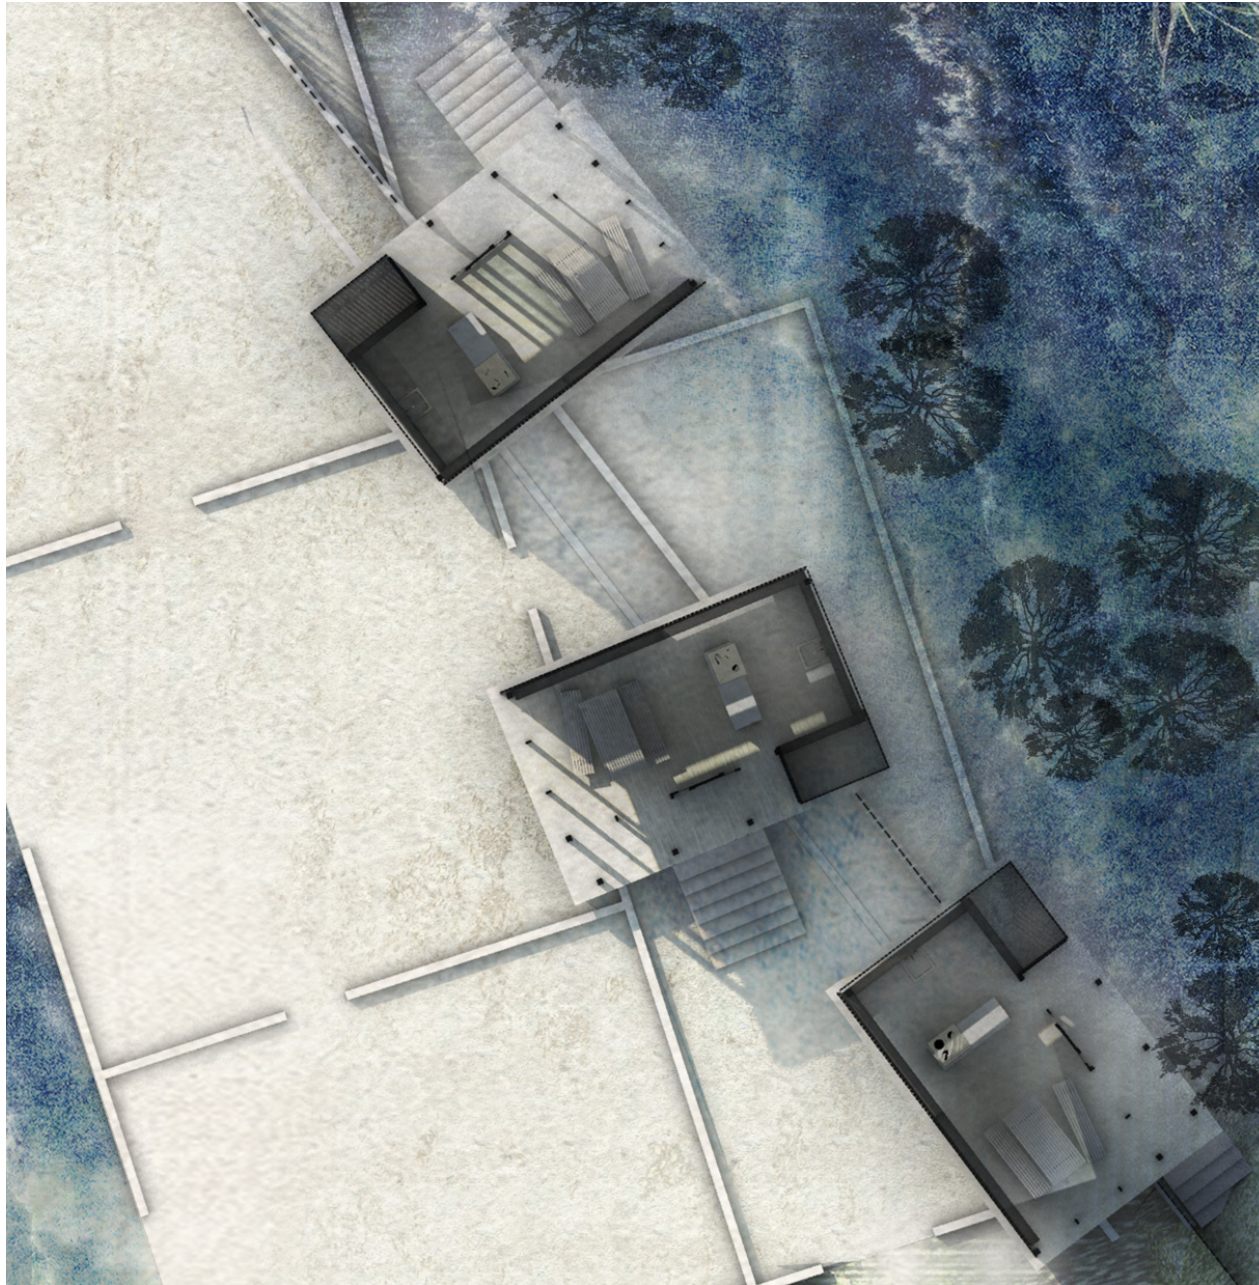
The floor plans of the kitchens showing their size and layout as well as their positioning over the main workshop. Each building has a deck that has the potential to become a bbq area Image by author.
